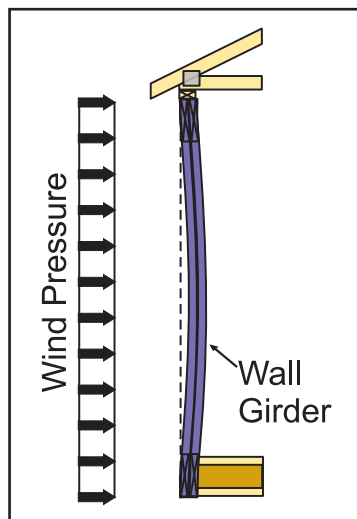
Lateral forces can cause lateral buckling of wall girders.
